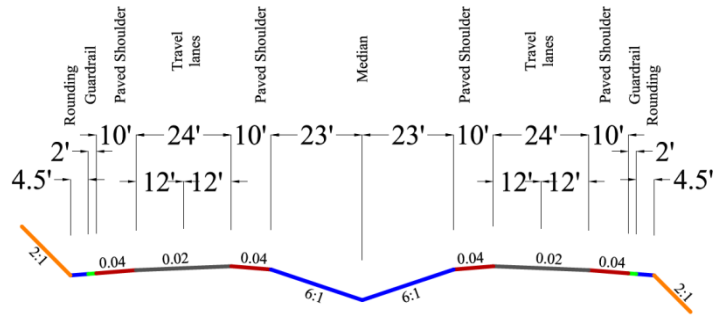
Typical Section for New Bypass in Segments B, D, F, and G
